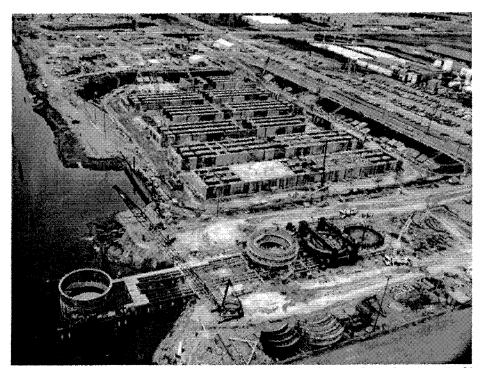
Graving Dock Where Pontoons and Bridge Anchors for West-Half of Hood Canal Bridge Were Constructed.
